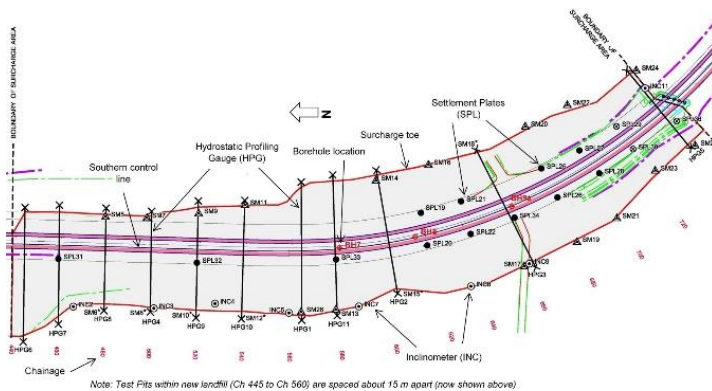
Plan showing treated section of proposed railway embankment, monitoring instrumentations
